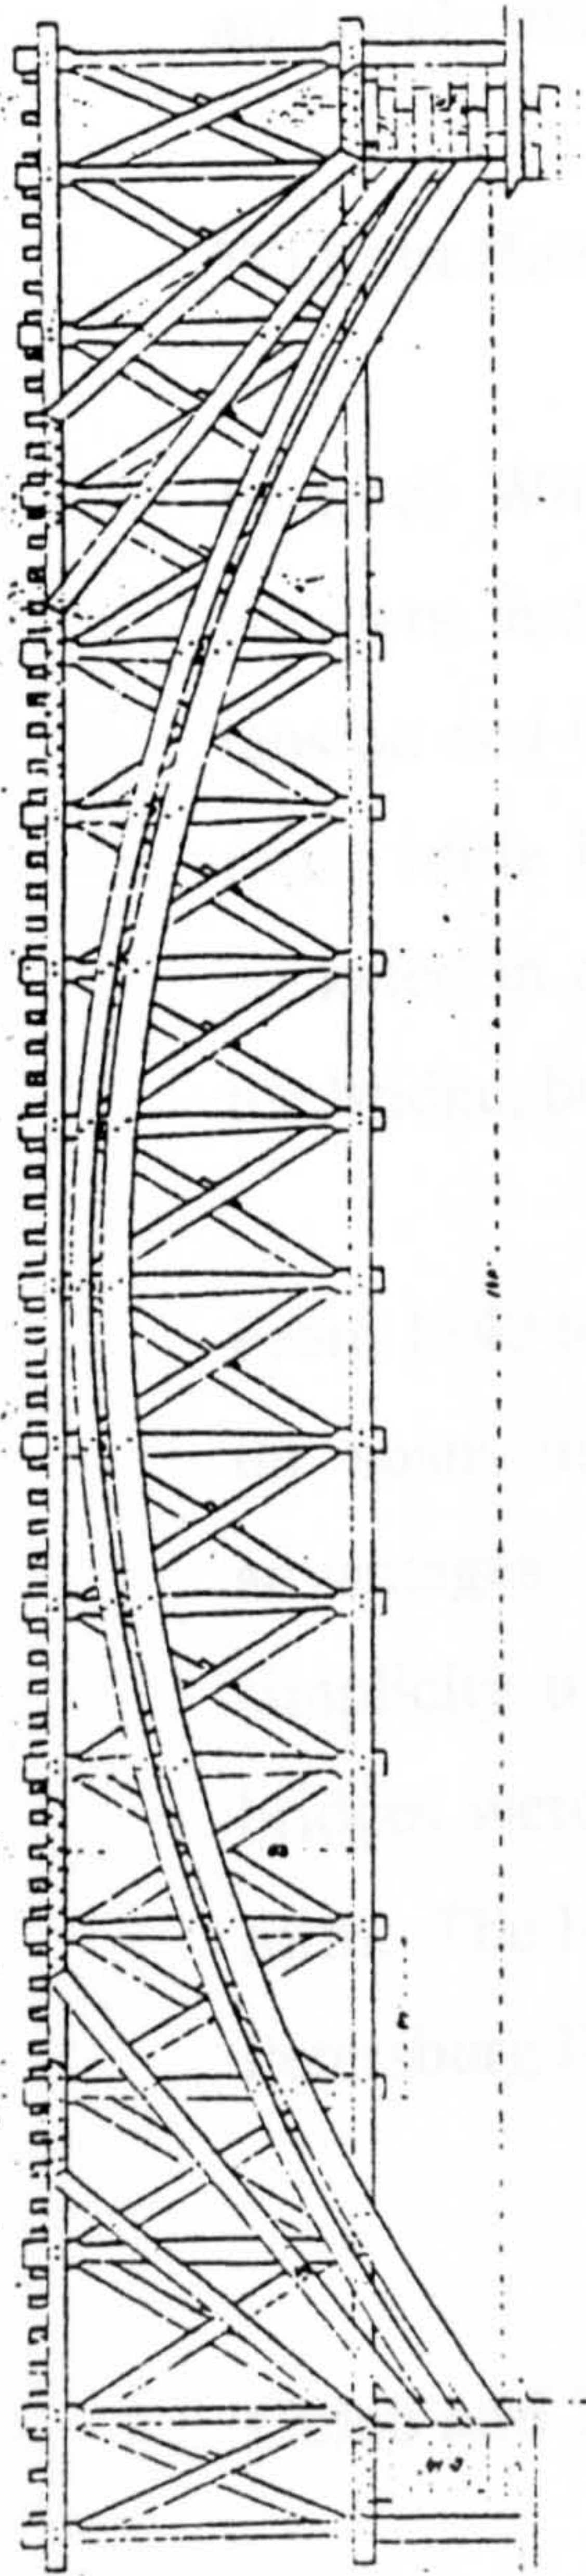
Burr bridge at Onion River, Burlington, Vermont.
